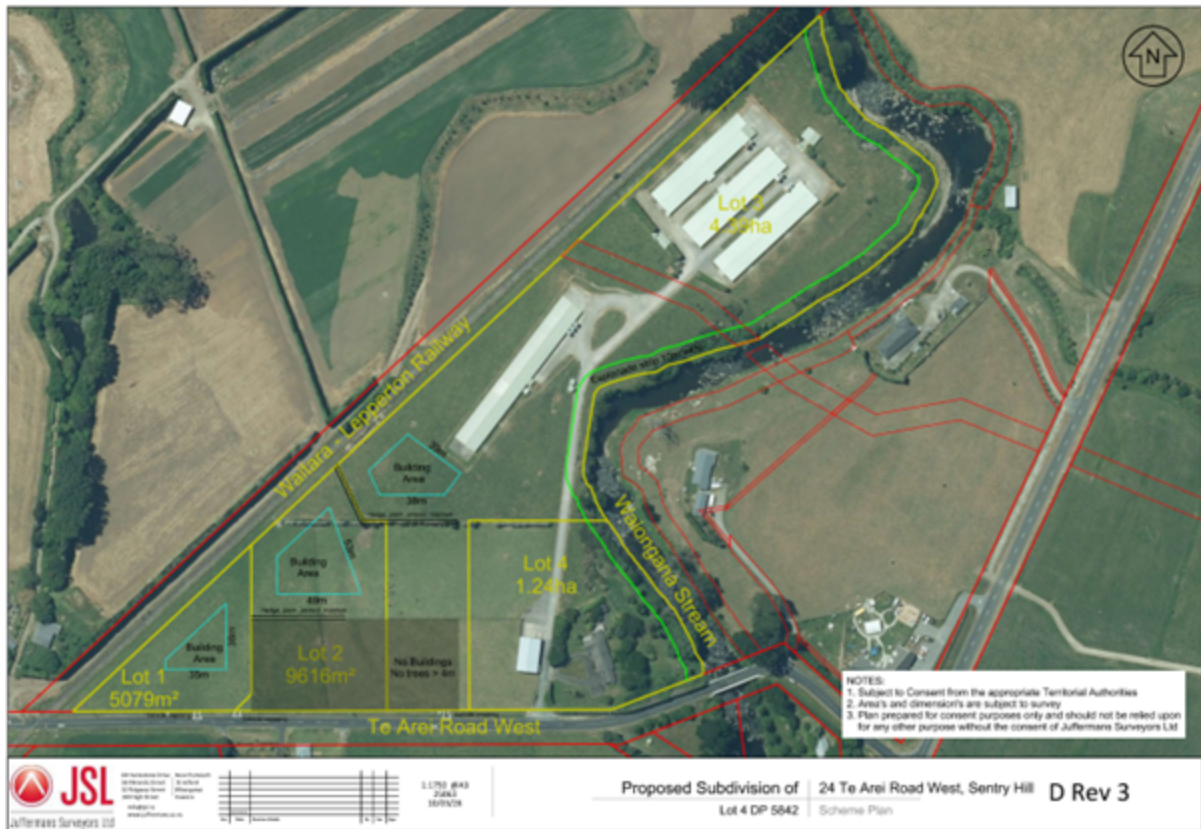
Subdivision Scheme Plan Showing Lots 1 and 2 Building Locations
